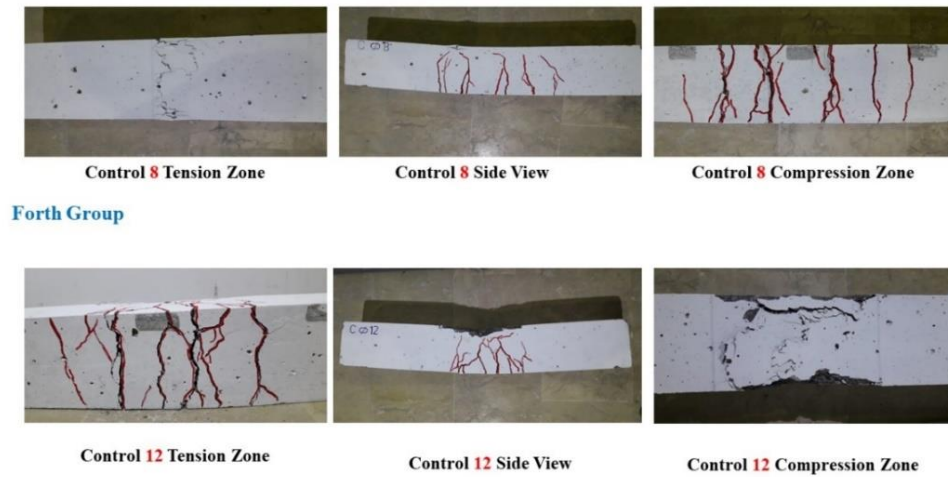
Patterns of the failures in the concrete beams (fourth group)
